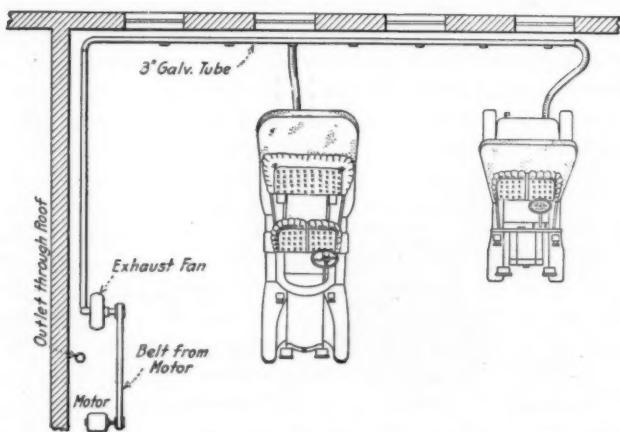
EXHAUST GAS VENTILATION INSTALLATION FOR A TYPICAL MOTOR CAR REPAIR SHOP.
